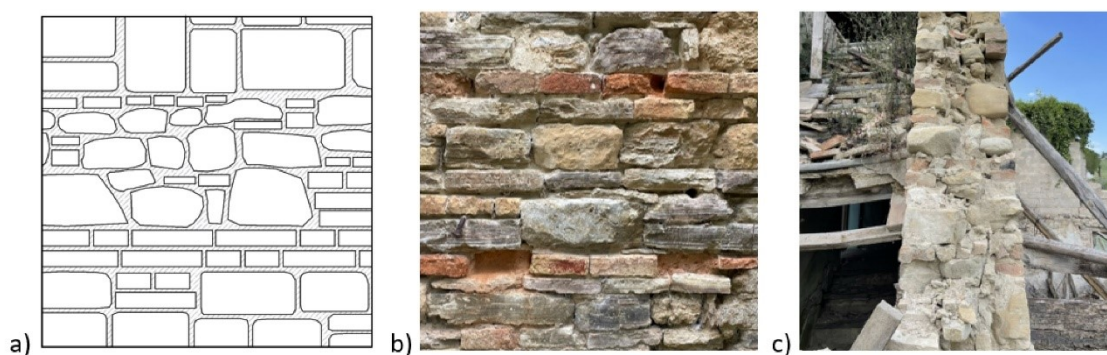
Stone-and-brick mixed (MX1) – a) Graphic reconstruction of the wall texture type (1mx1m); b) Wall façade example, photo taken in Camporotondo di Fiastrone (MC); c) Wall section example, photo taken in and Treia (MC).
